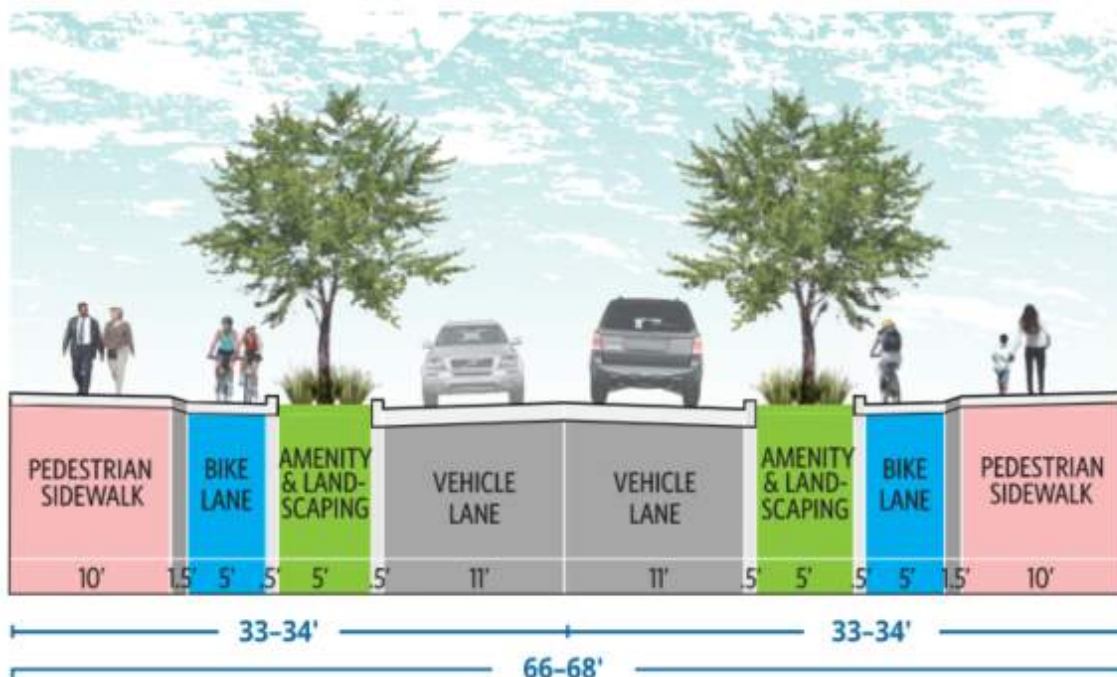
Bike Lane Adjacent to Sidewalk, Separated Vertically from Sidewalk
